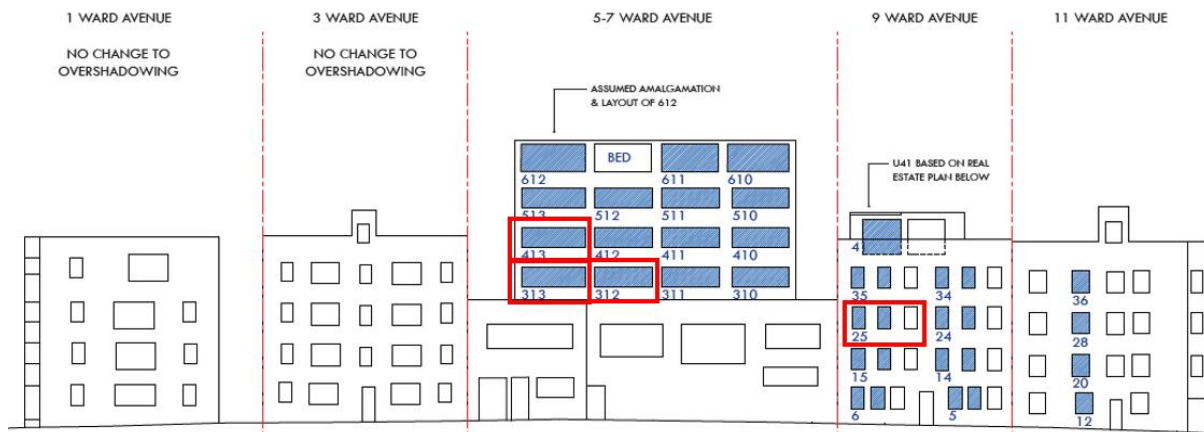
Elevation of all residential flat buildings facing Barncleuth Lane. The apartments with solar access reduced to below two hours shown in red, and living rooms shown in blue.
